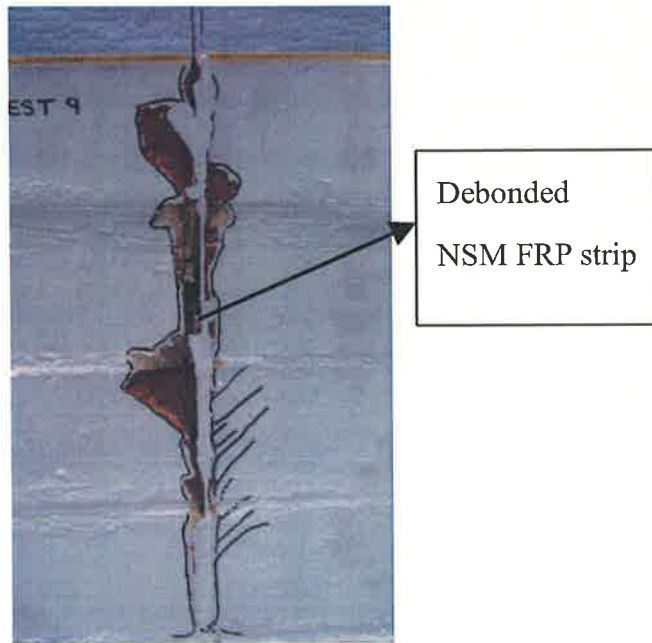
Debonding failure of CFRP NSM specimen (HO1.0-4-15-0-NSG)
